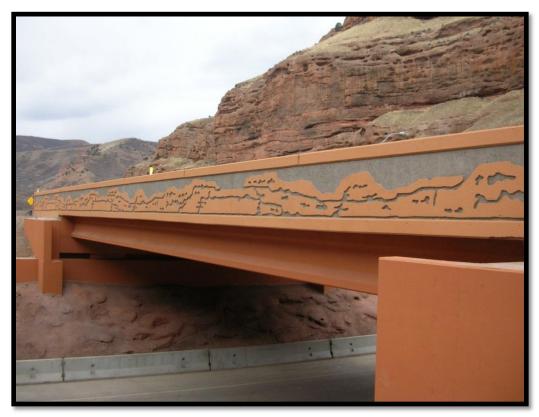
Three-Span Overpass Bridge Converted to a Single-Span on the I-80 Echo Road Bridge Project (After)
